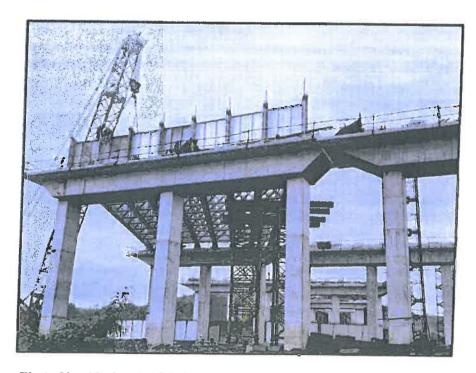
Jasai ROB Span RP26-27 Girder's Erection completed
